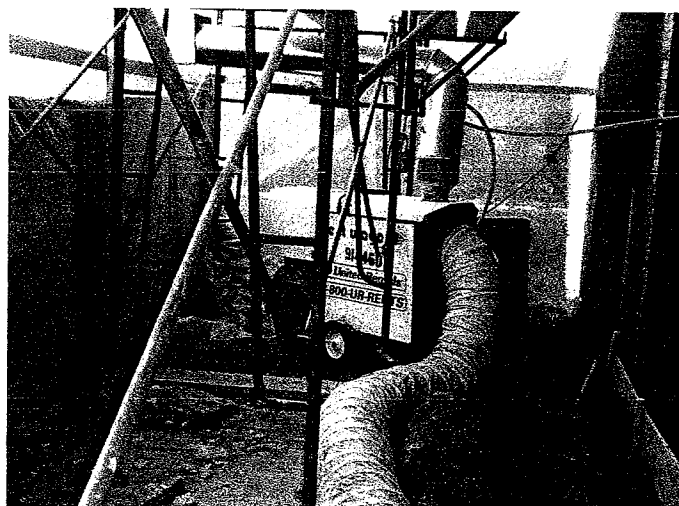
Heating and tenting provided full length of building along Congress St. (Grid A)
